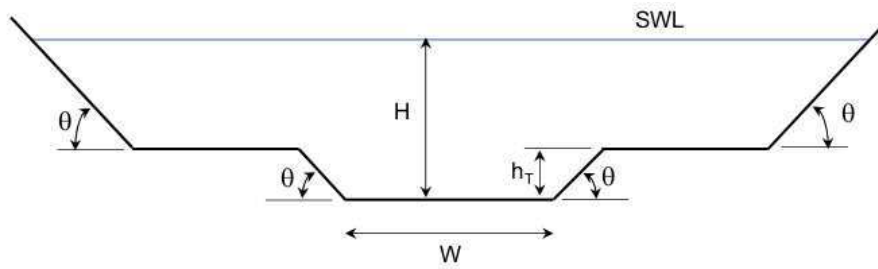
Channel with trapezoidal cross-section and trapezoidal trench
